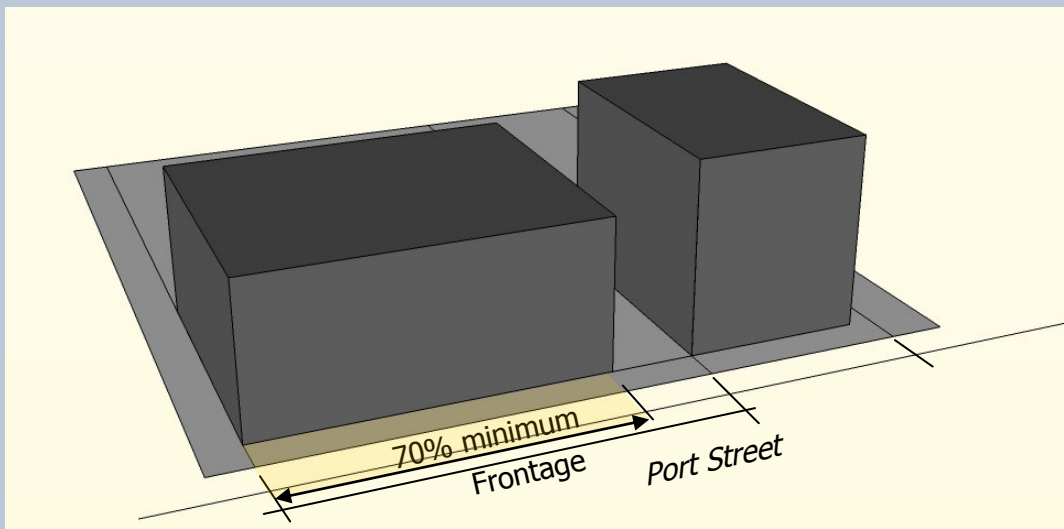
A minimum of 70% of the building shall front onto Port Street East and be within 0.0 m to 3.0 m
